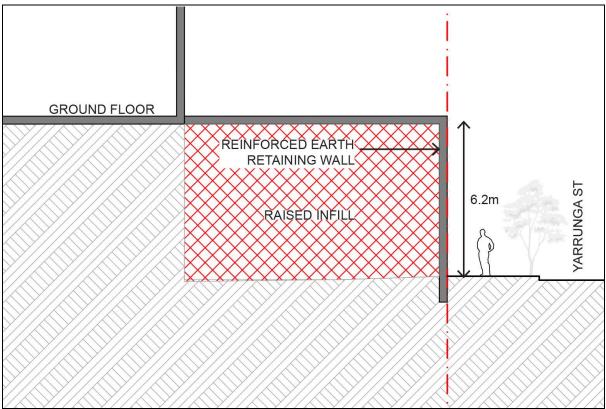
5-35 Yarrunga St sectional diagram showing relationship to existing street level.
